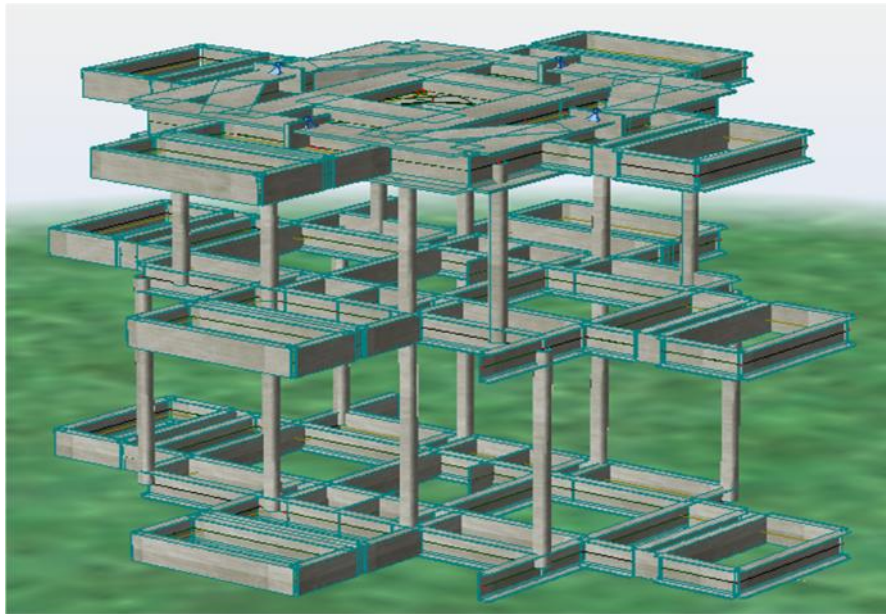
Model View (BOP ACCESS PLATFORM + LIFTING FRAME)
